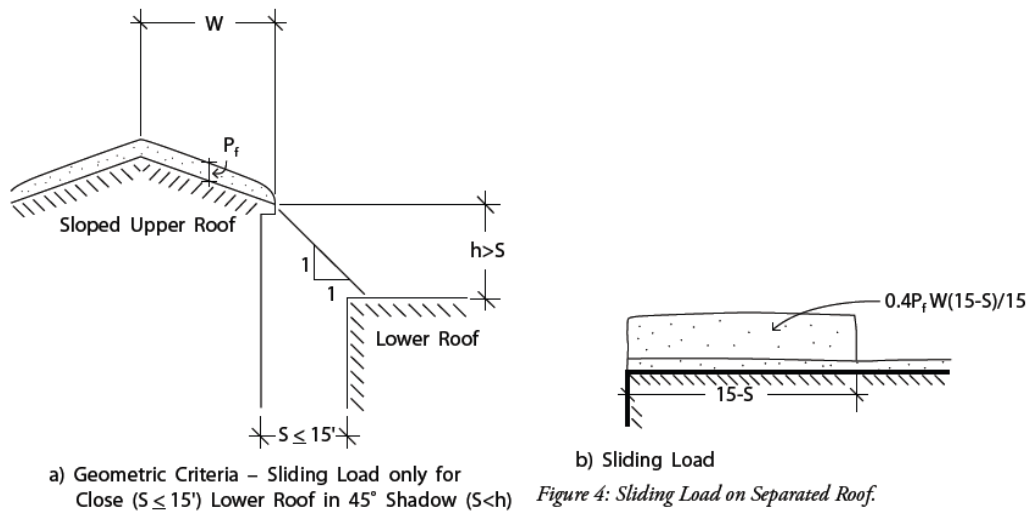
A.8 – Sliding load on separated roof (O'Rourke 2011).
